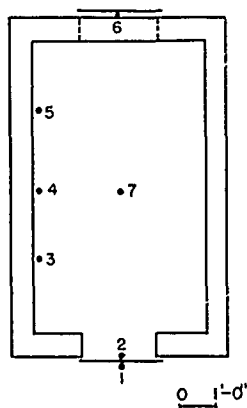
Film dosimeter locations in reinforced-concrete bathroom shelter in rambler houses; Stations 1-31.1 c-1 and c-2.
